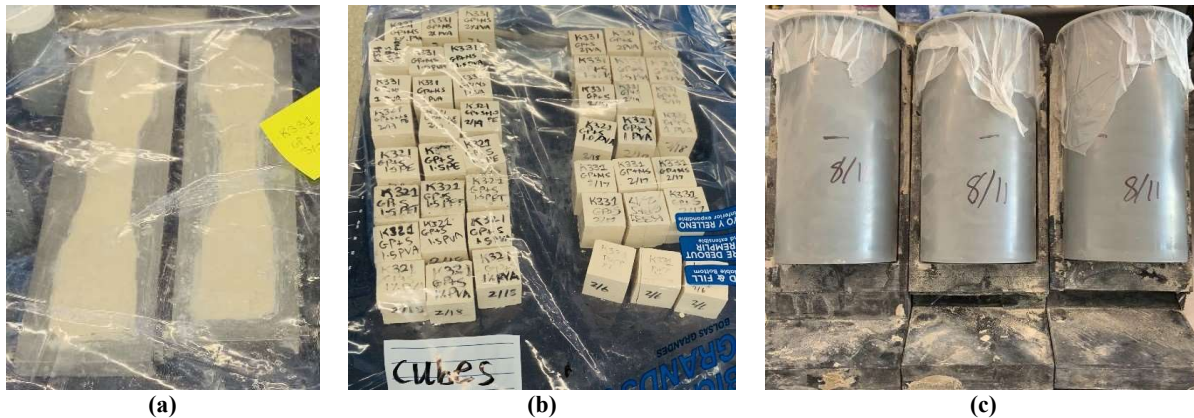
Casting and curing of GP materials: (a) dog-bone specimens after casting, (b) cube specimens during curing, and (c) slant shear test setup.
